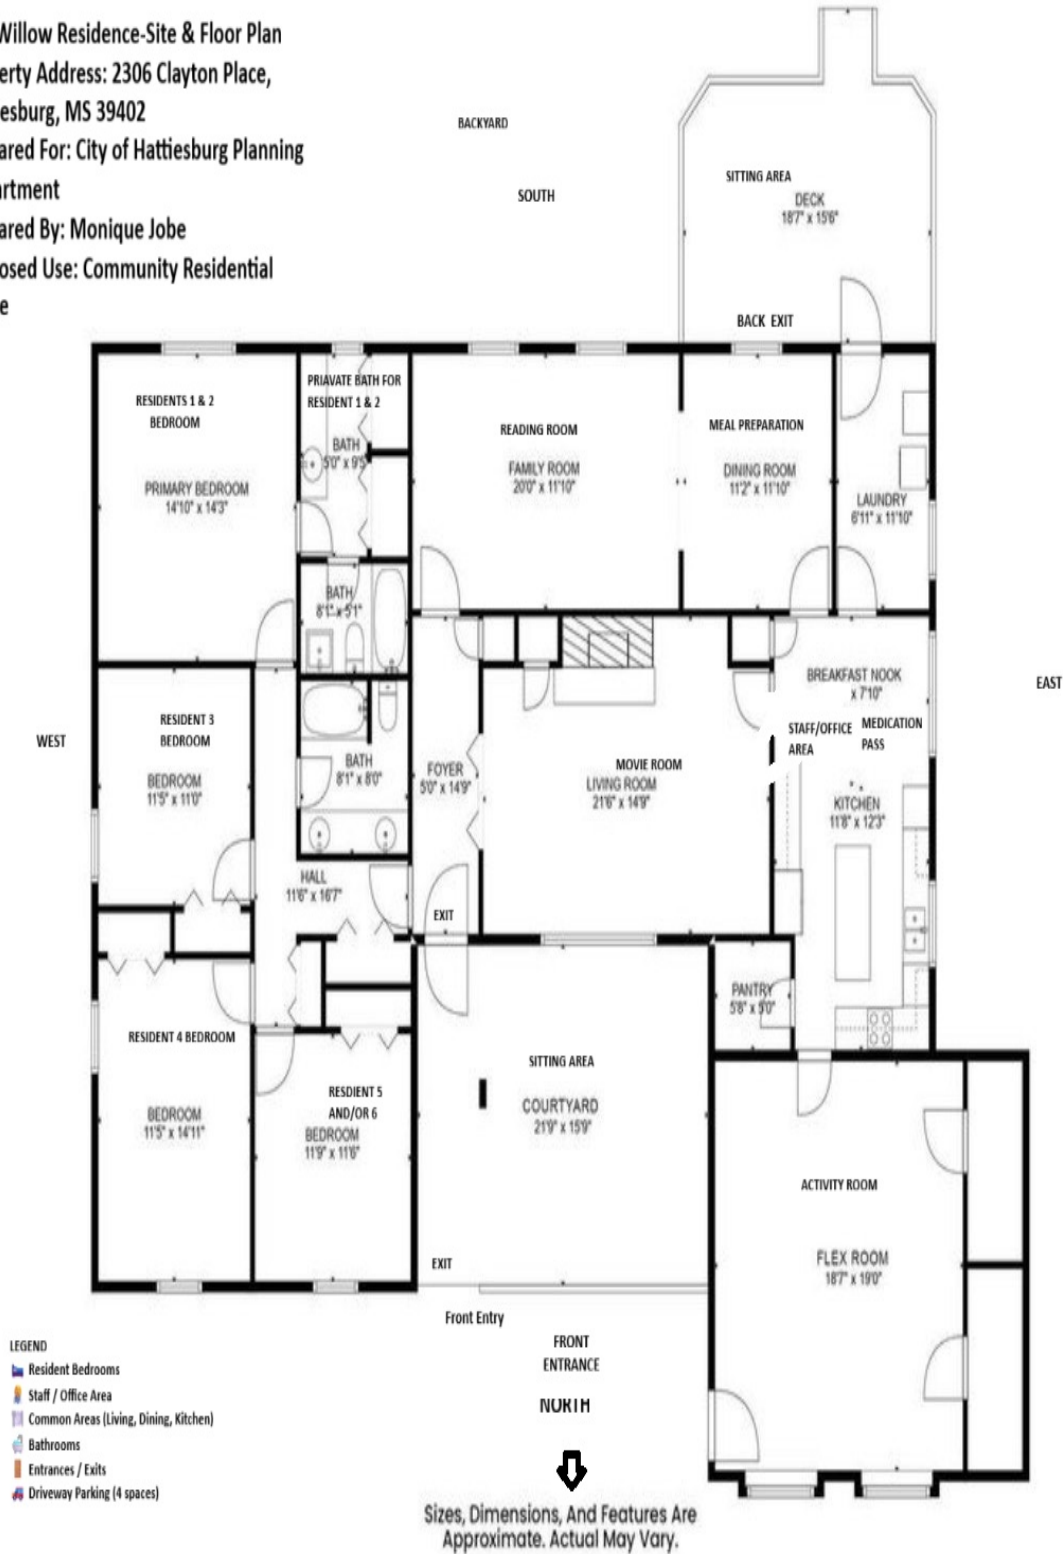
The Willow Residence – Floor Plan and Site Orientation
